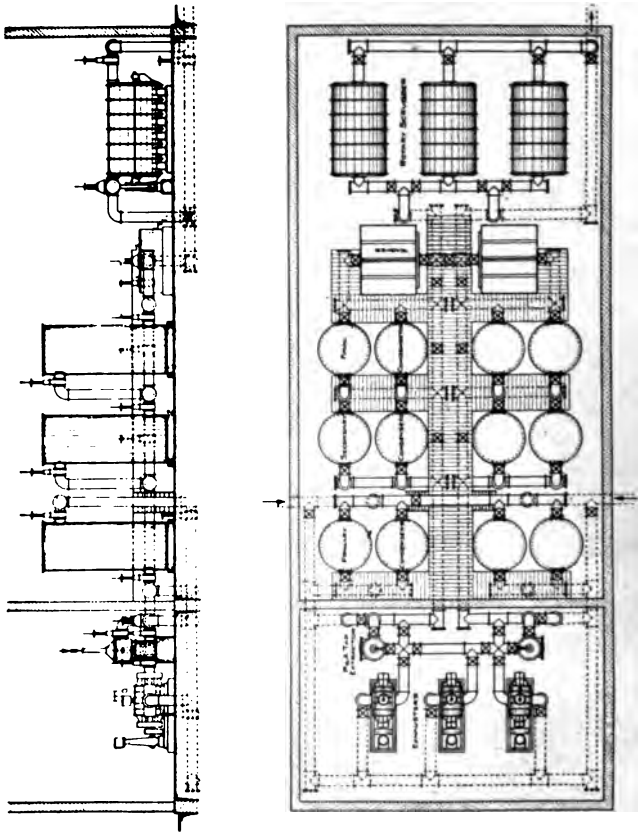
Elevation and Plan of Coal-gas Cleaning System
